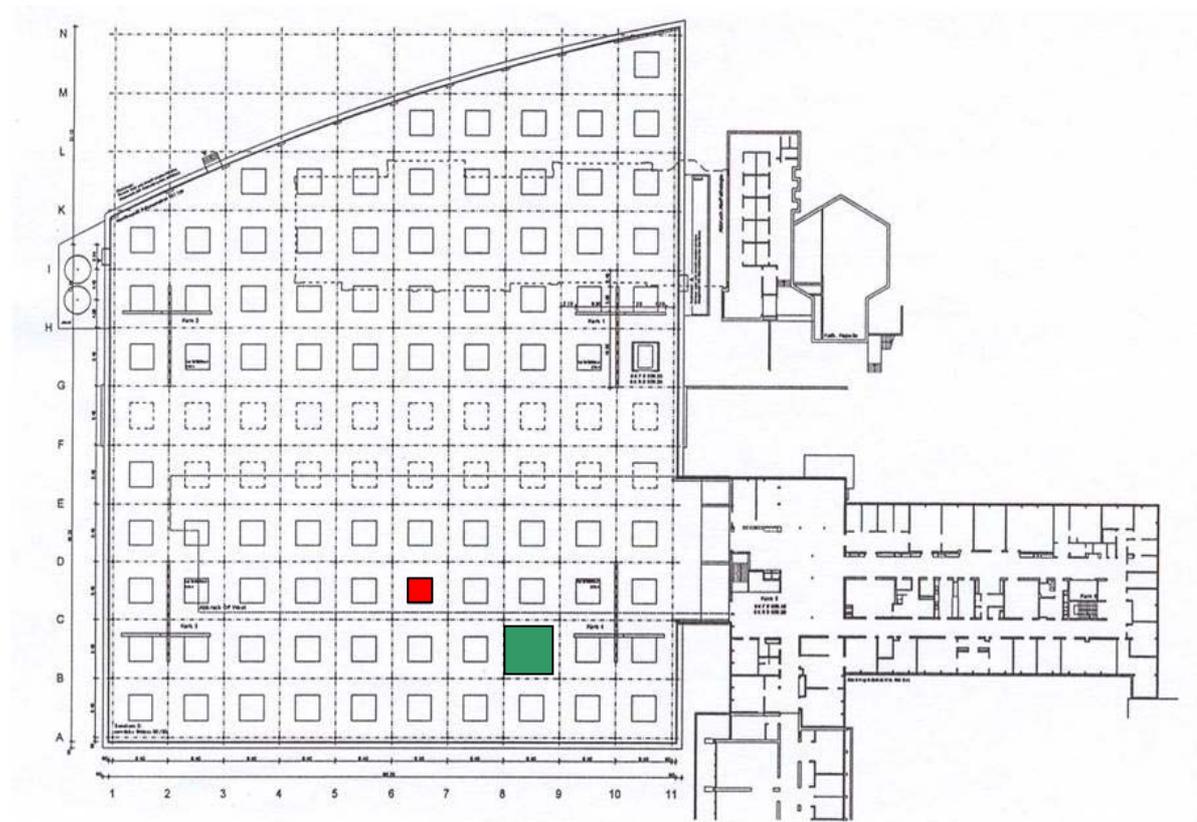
Plan of a typical floor of the Primary System, showing 8.4m x 8.4m structural grid. The primary System architect was Peter Kamm and Kundig, Architects. This firm
